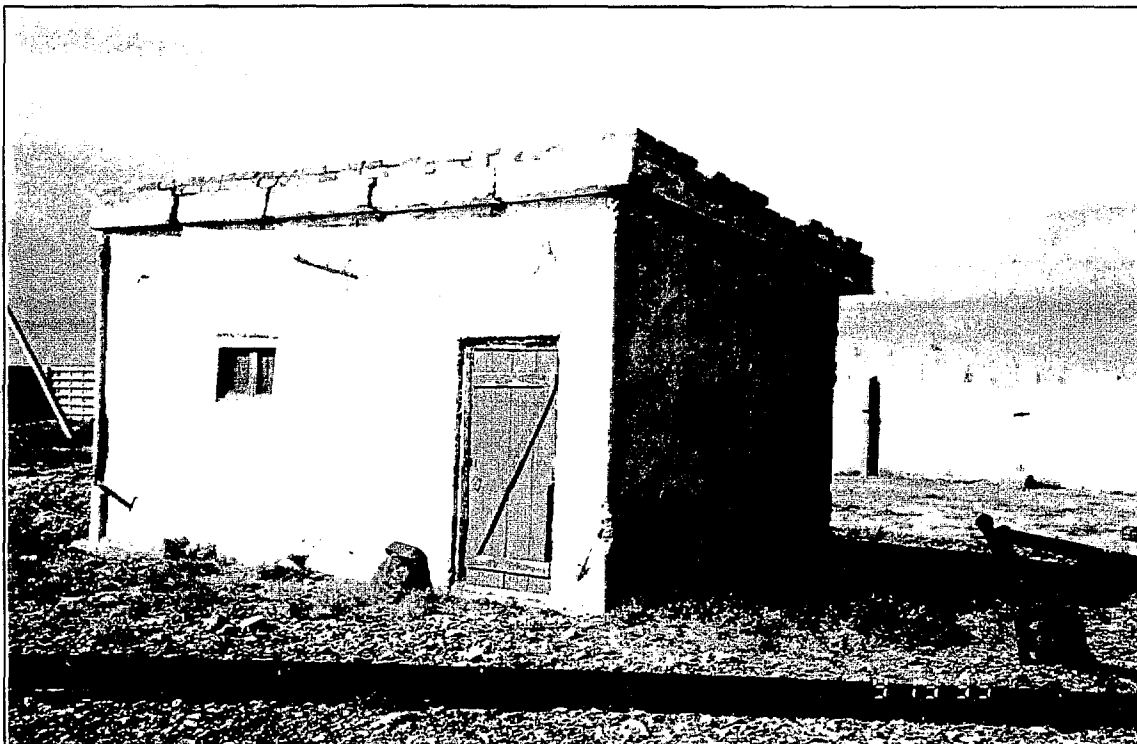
Pumphouse construction of brick and mortar, covered by concrete plaster, typical of Wells 18 to 20. Constructed from 1985 to 1987.
